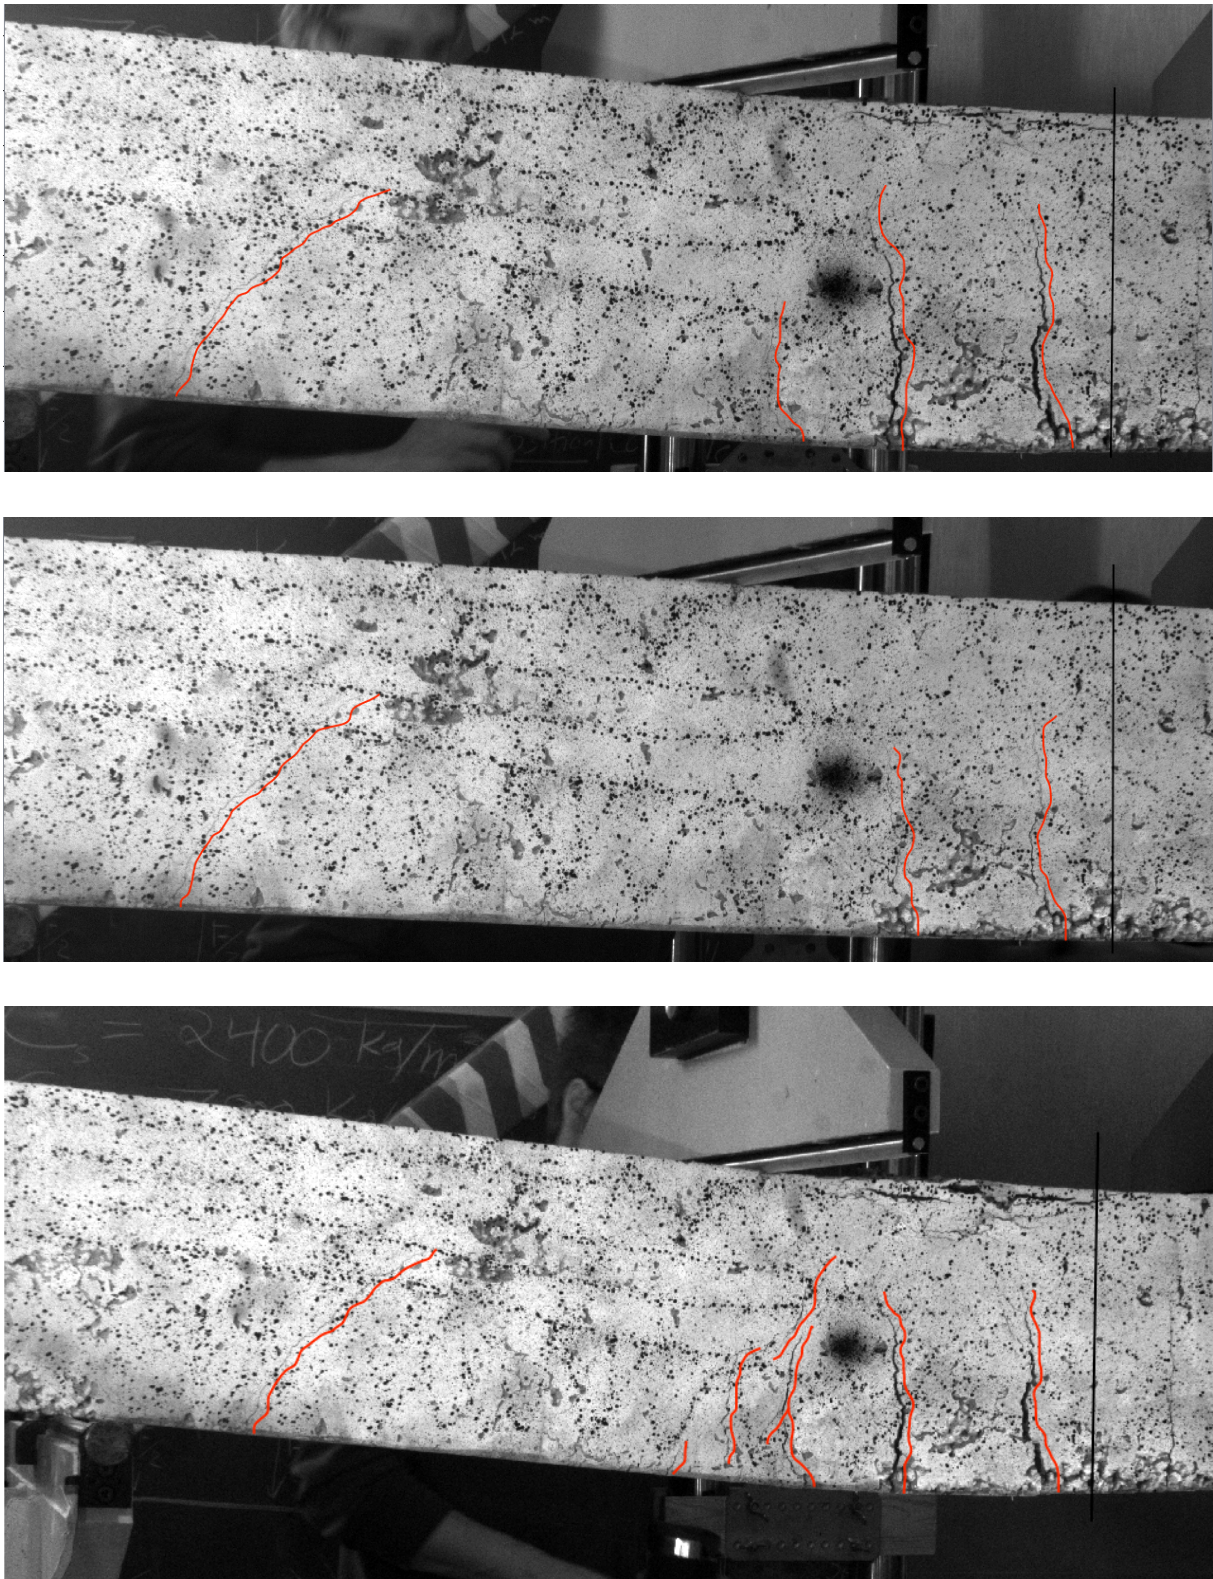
Crack pattern for experimental concrete beam containing 1.0% recycled steel fibres
